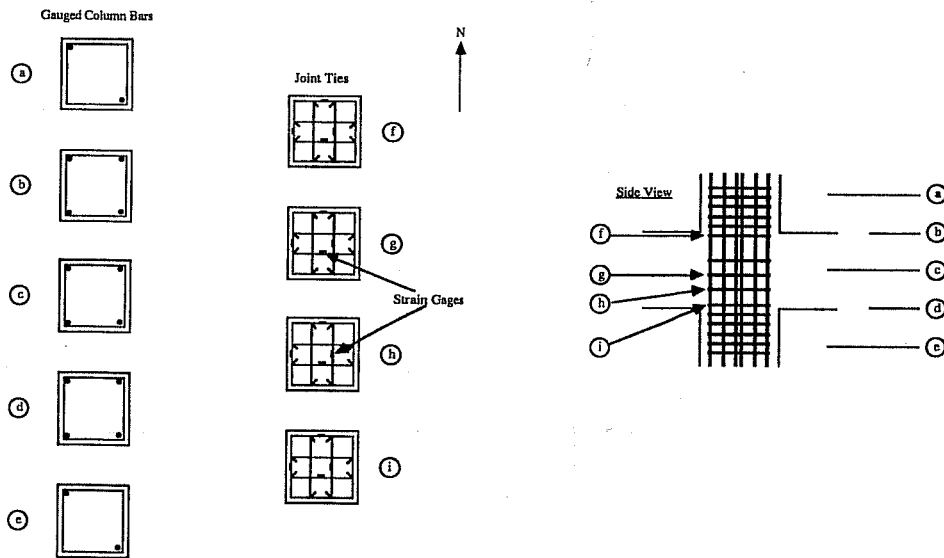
Strain gage positions on column bars and joint ties (Specimen J6)
